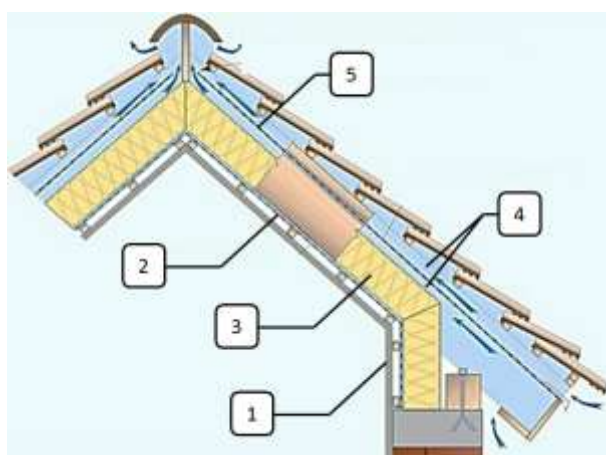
Insulation of the attic floor: 1 - gypsum board, 2 - vapor barrier, 3 - insulation, 4 - air gap, 5 - waterproofing.
